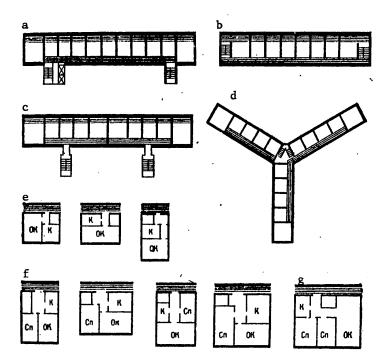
Layouts of gallery and gallery-sectional buildings. a--Gallery buildings with stairs outside the dimensions of the building; b--the same with stairs included in the dimensions of the building; c--gallery-sectional with stairs outside the dimensions of the building; d--three-leaved with stairs included in the building dimensions.
